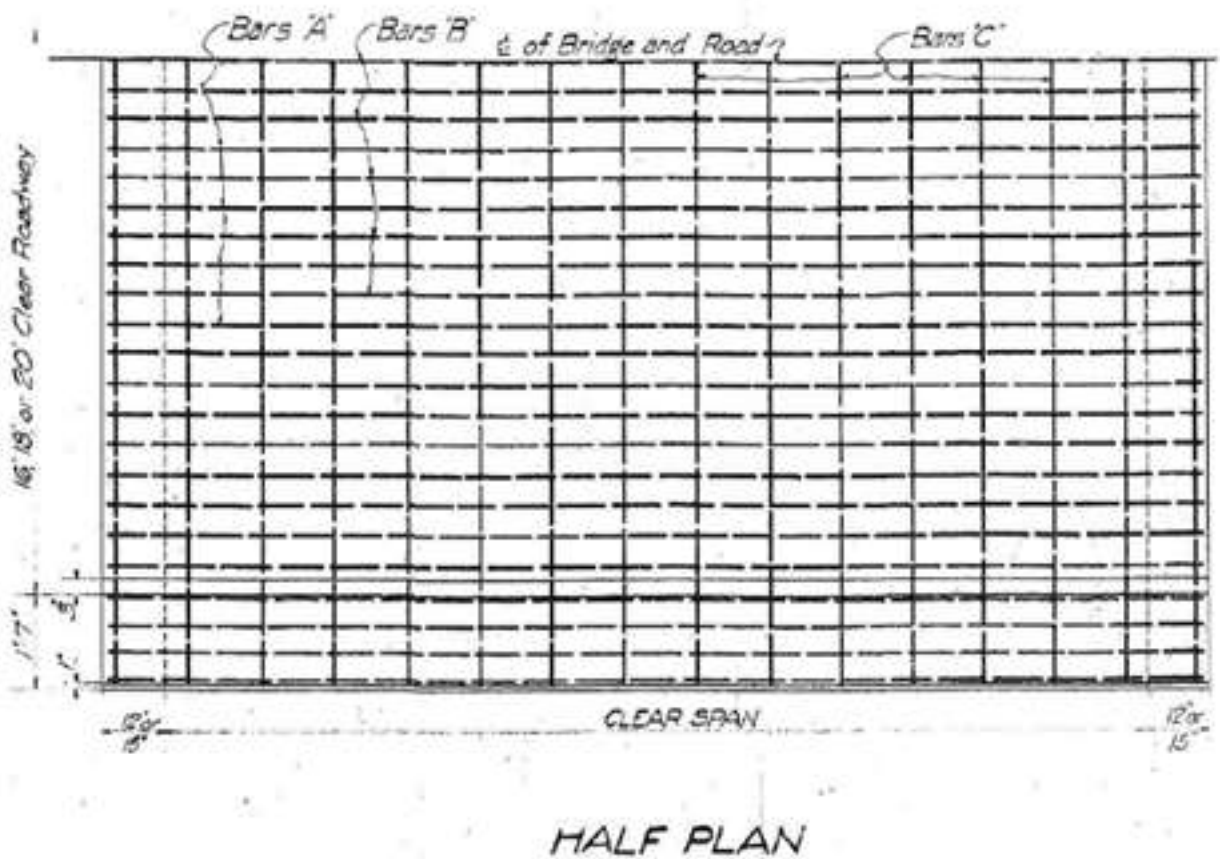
Bars A, B, and C Configuration in a Plan View for SHDA (1922)
